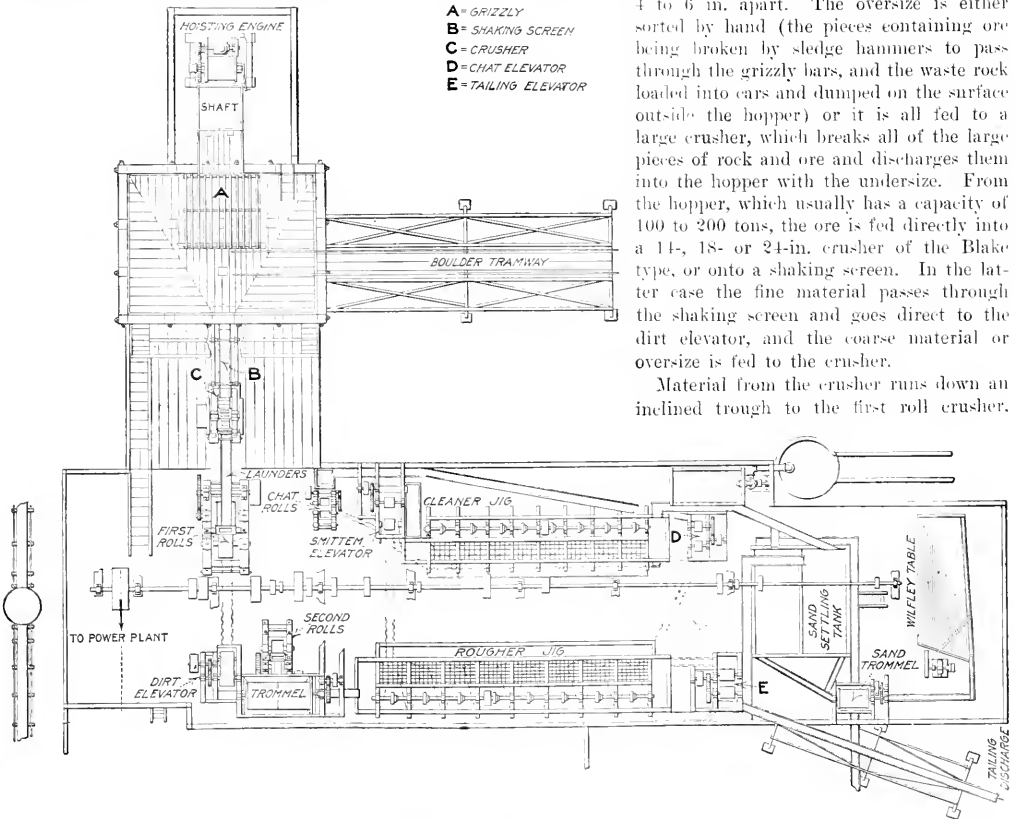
PLAN OF TYPICAL 150-TON MILL, WISCONSIN ZINC DISTRICT
